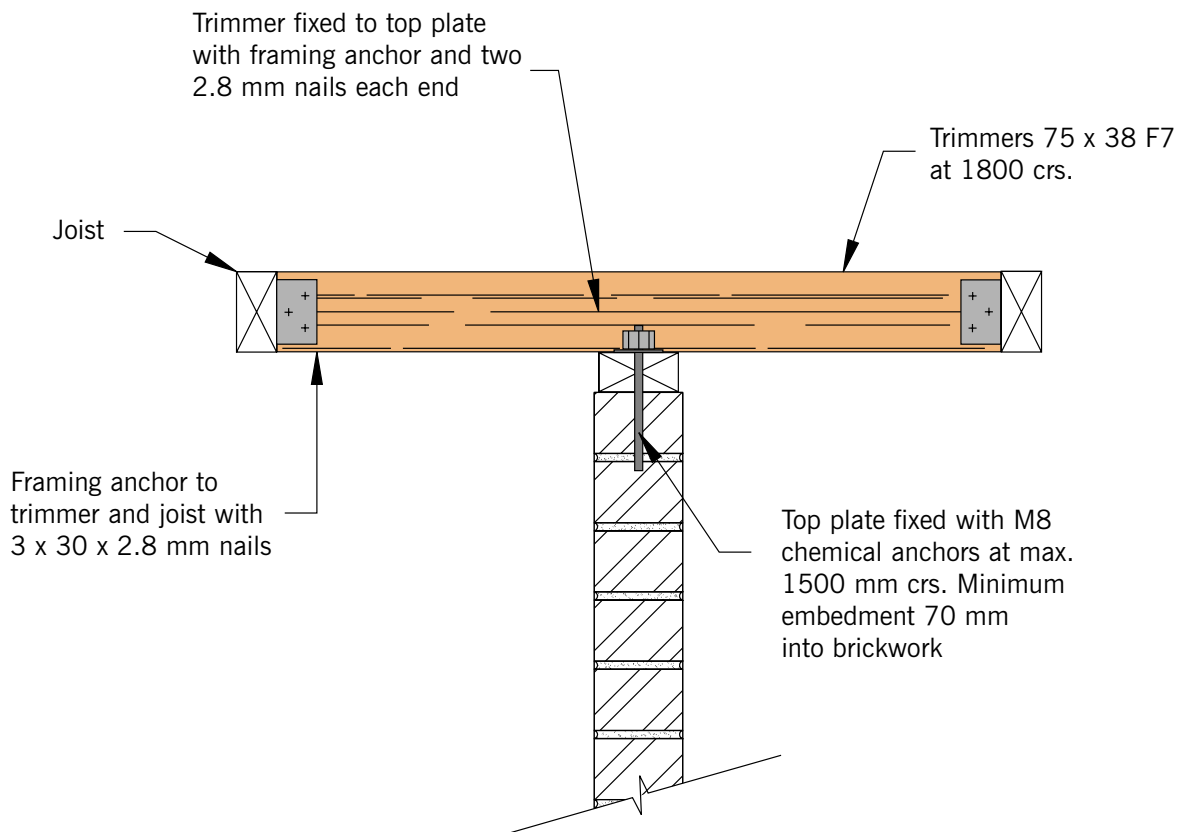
Roof tie-down - hollow-unit wall (earthquake and high wind)
